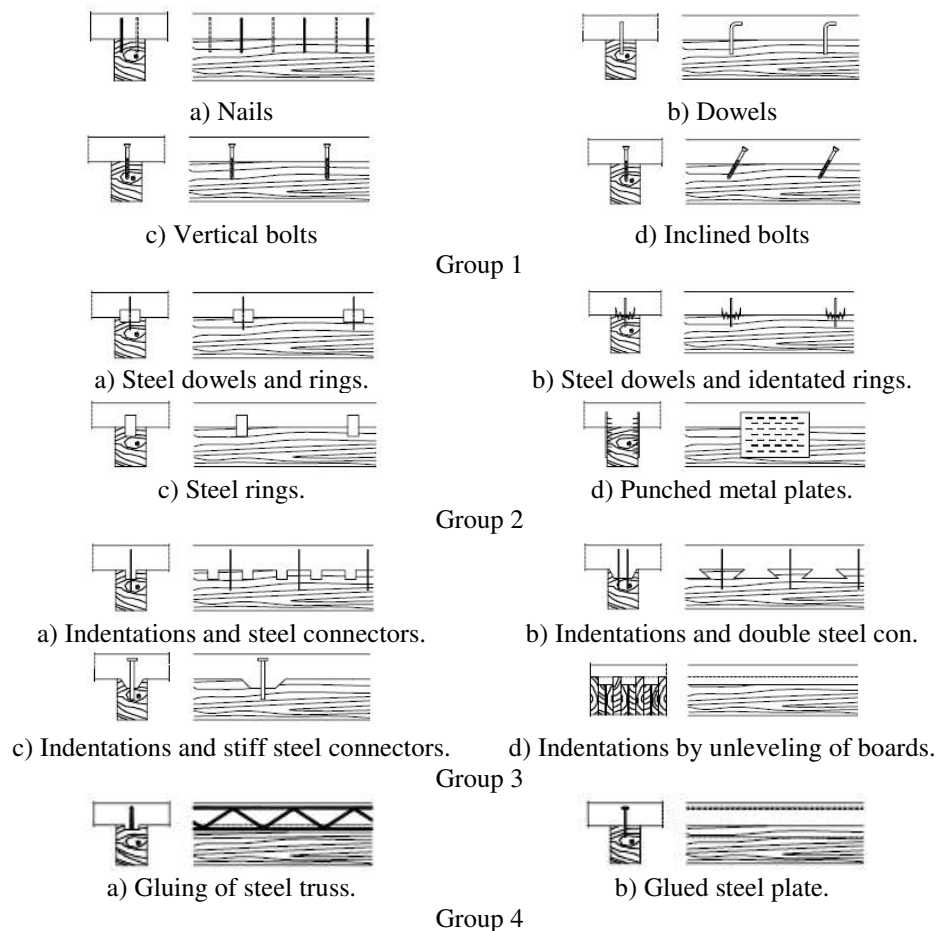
Possible connection systems between in timber-concrete composite slabs.
